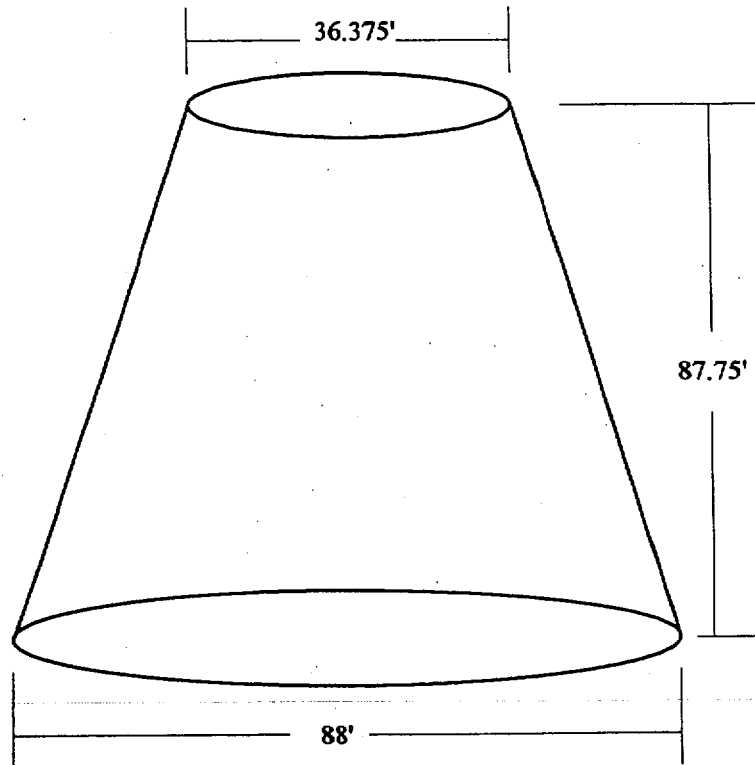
Idealized geometry of drywell for purposes of calculating heat transfer dimensions.
